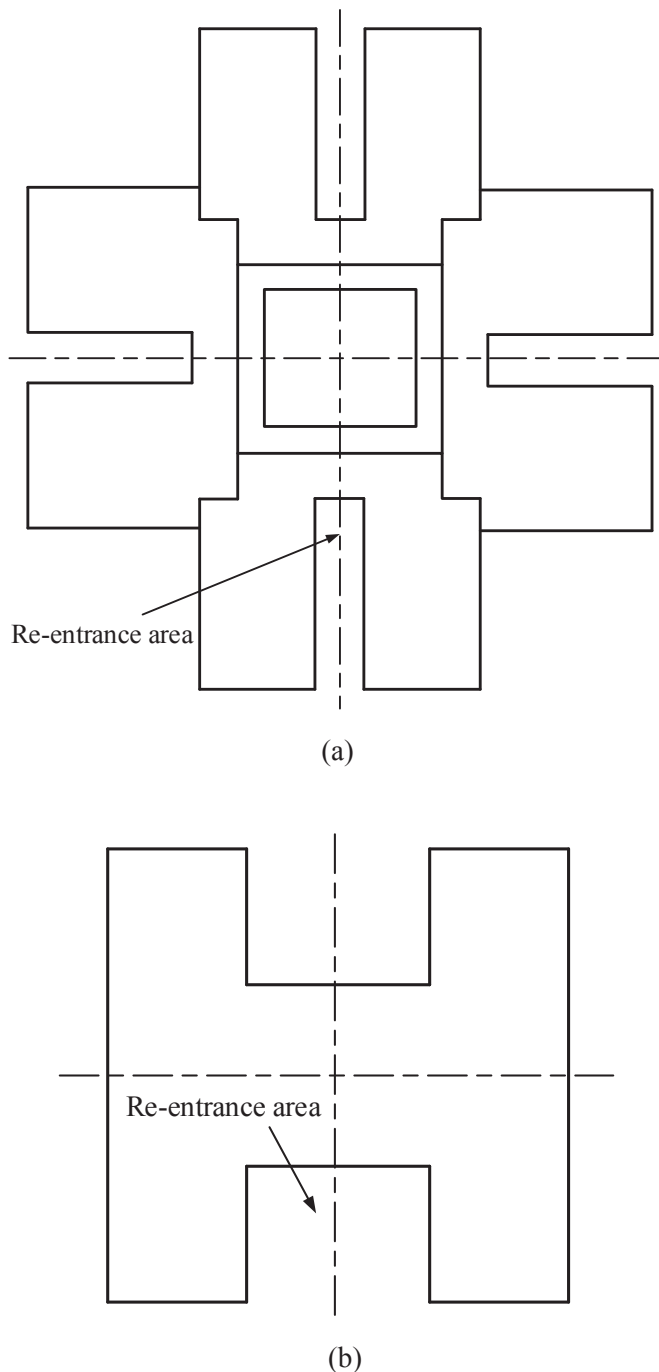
Schematic plan view of the studied building models: (a) the cross floorplan; (b) the H-like floorplan.
